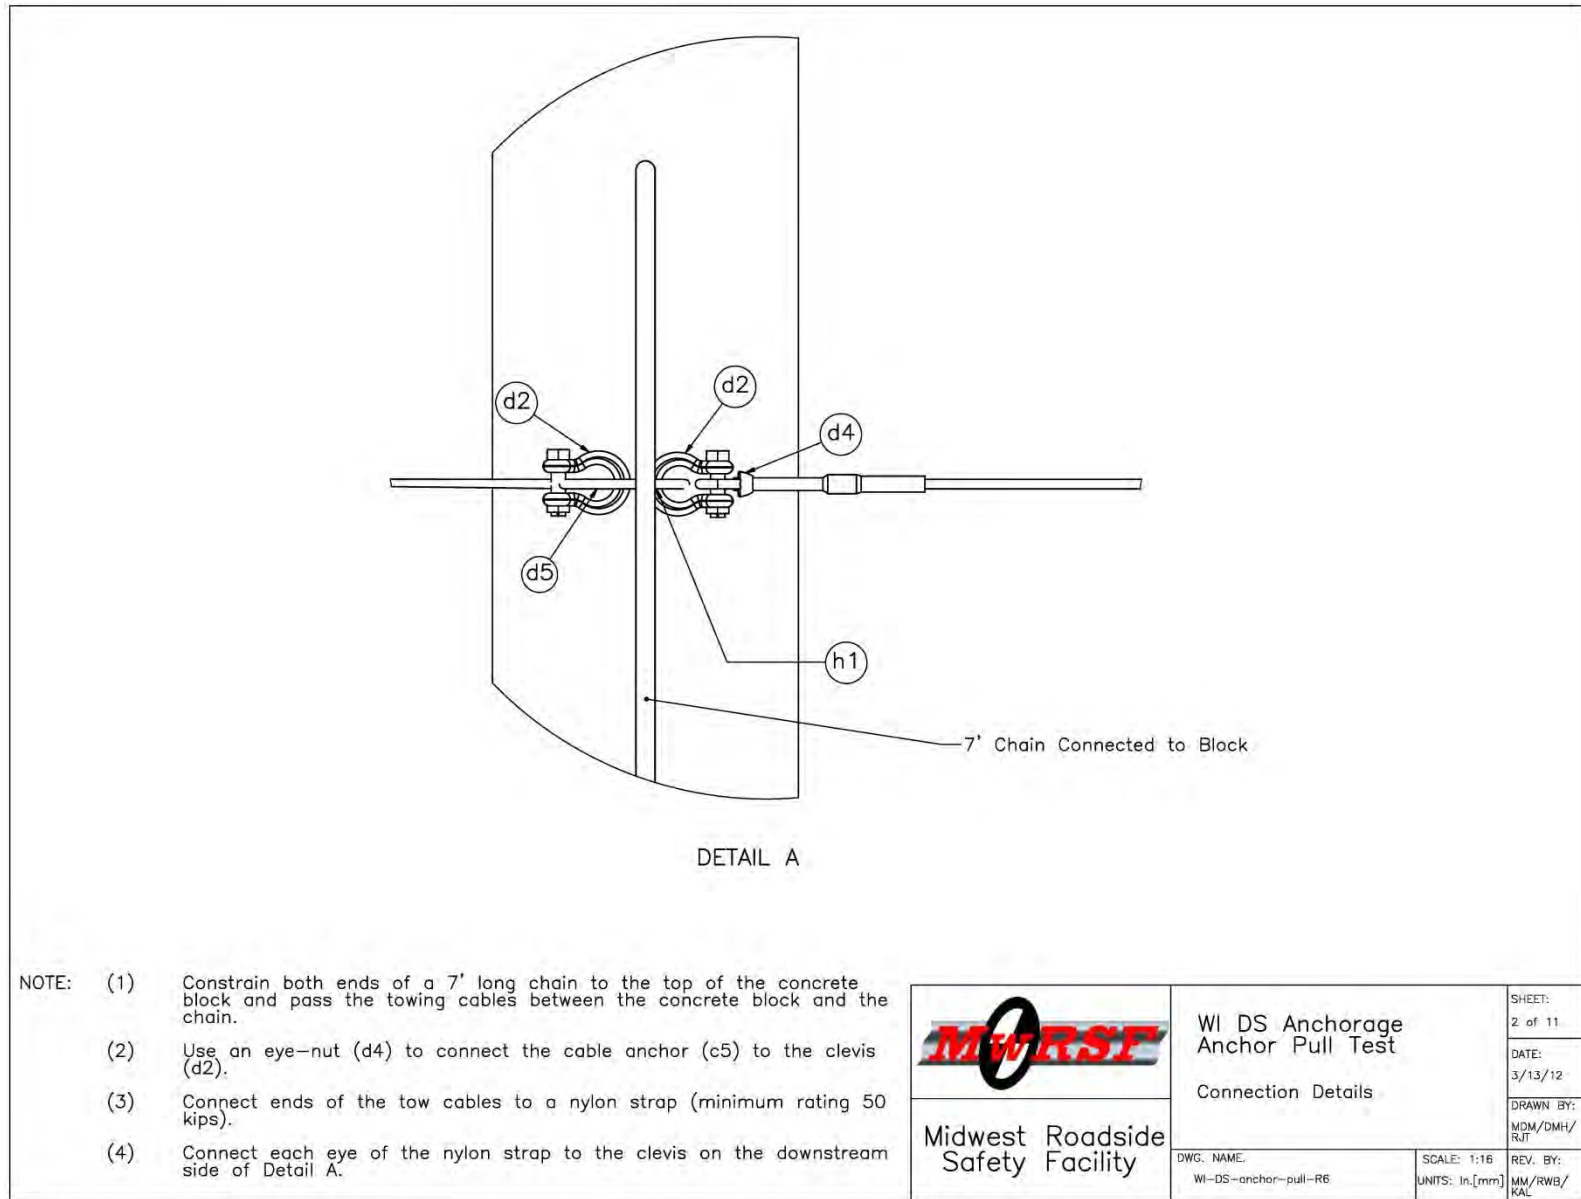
Connection Details, Test Nos. DSAP-1 and DSAP-2
